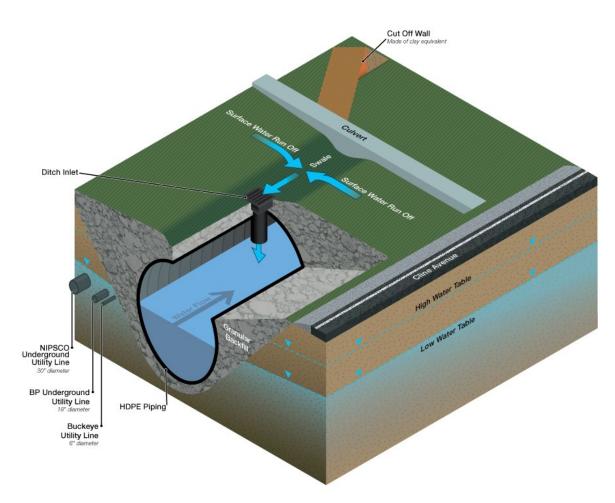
Alternative 3 – Storm Sewer Installation within Ditch – Conceptual Sketch
